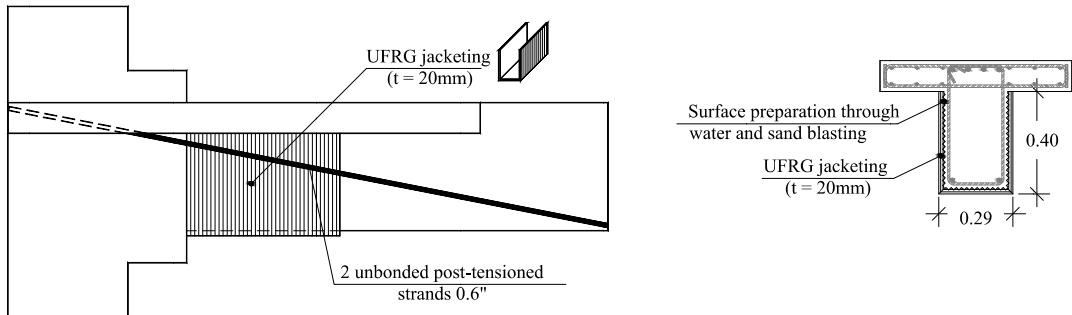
Detailing of the UFFG jacketing and unbonded strand post-tensioning system (specimen S3)
